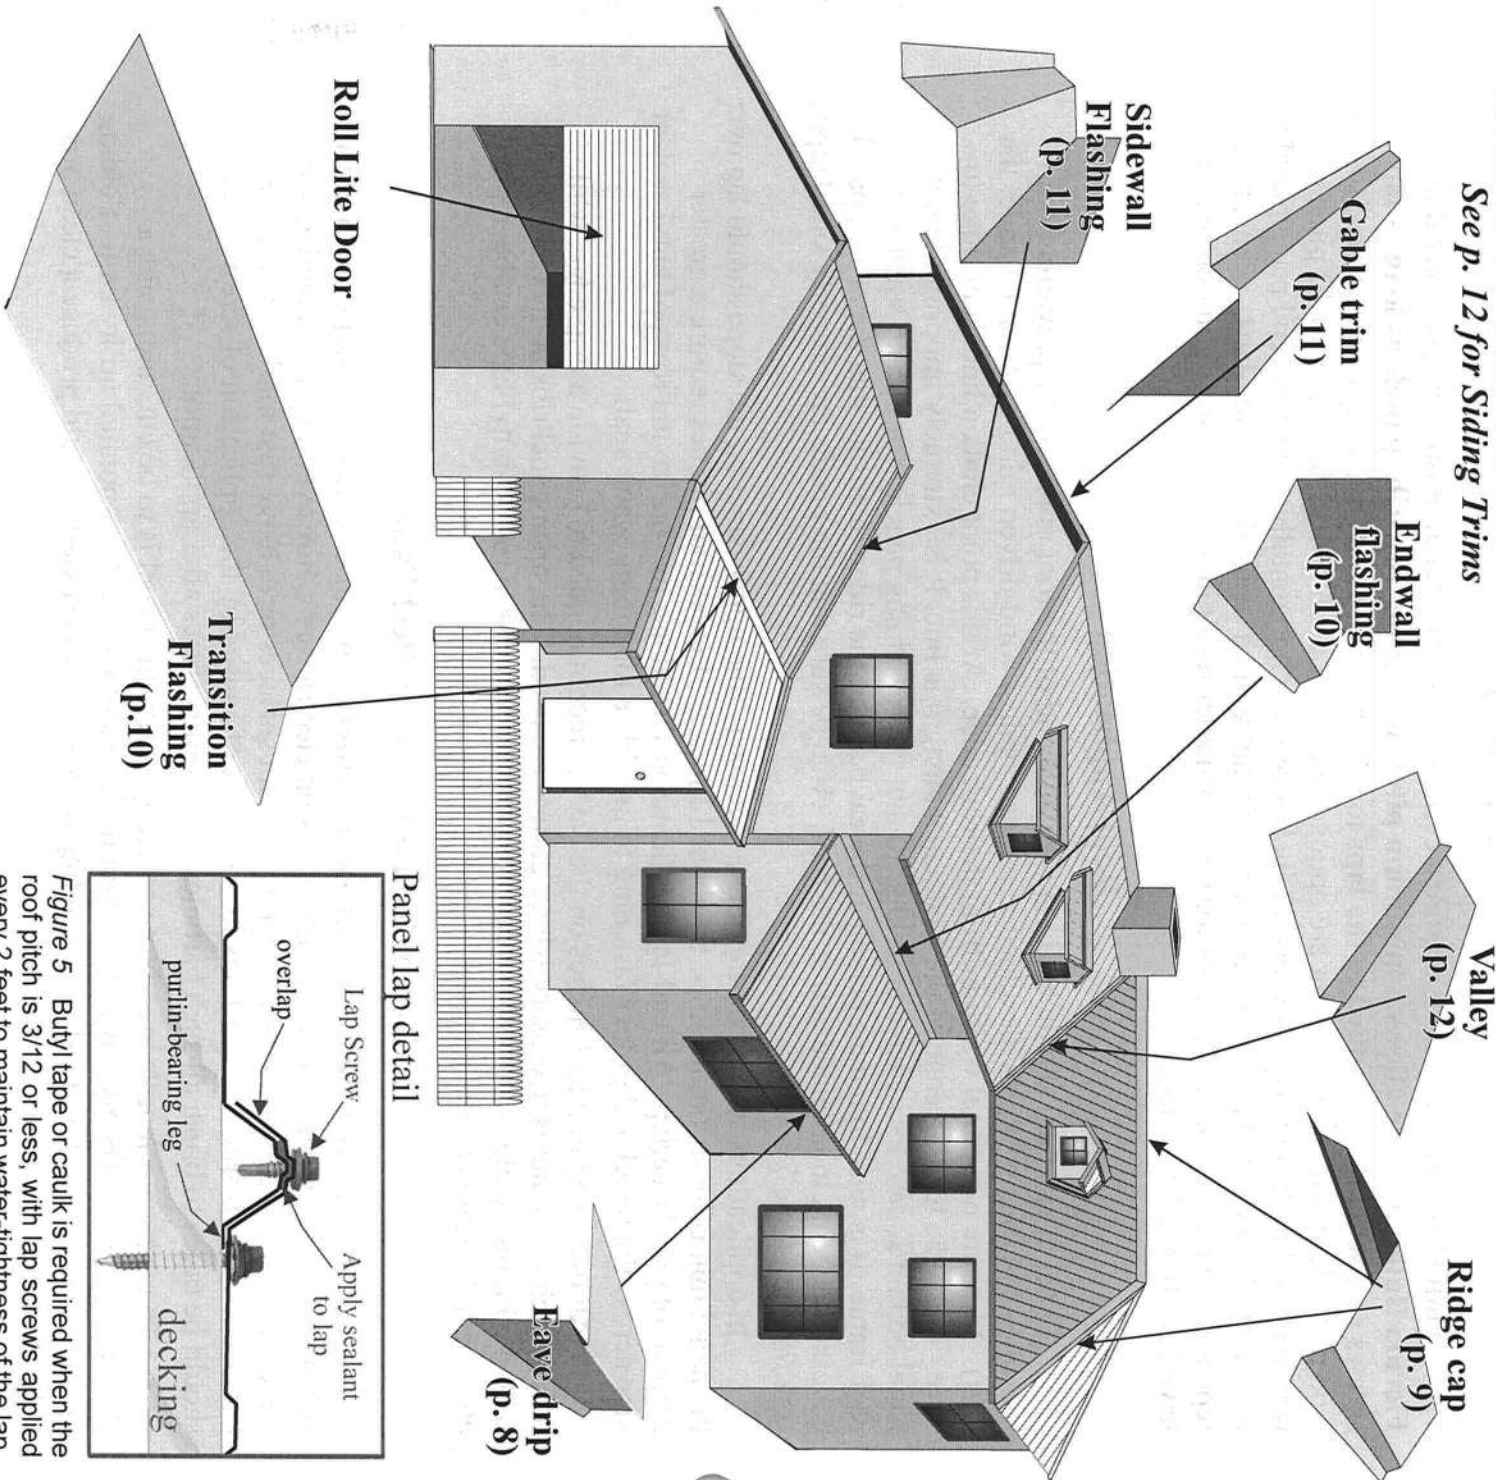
Roofing trims and flashings are named by the location or function of that particular piece on the building.
